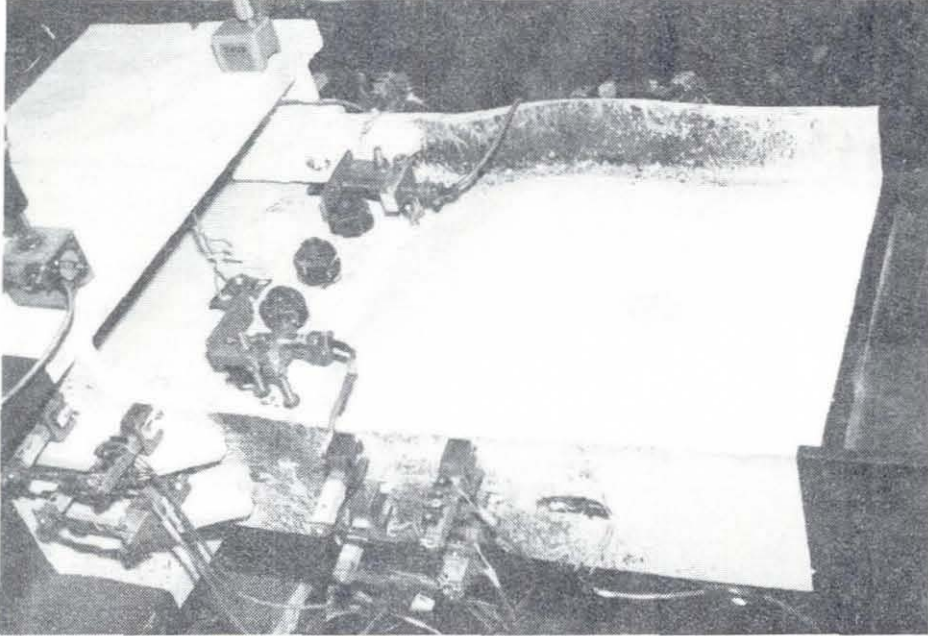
Local Buckling of Beam Flanges (Specimen 1)
